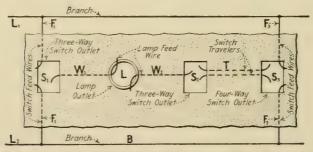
Showing conductor arrangement for Carter-connection of a three-location lamp control, employing two three-way switches and one four-way switch, as it appears at the outlets before connection to the switches and lamps.
